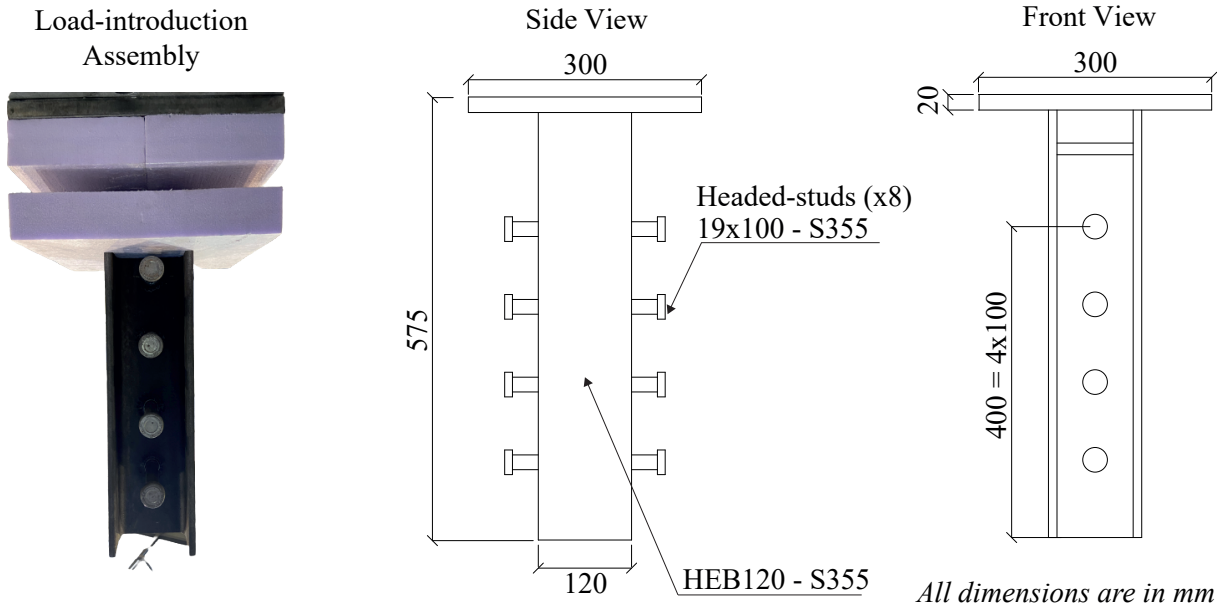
Load-introduction assembly of GJSFB test campaign.
